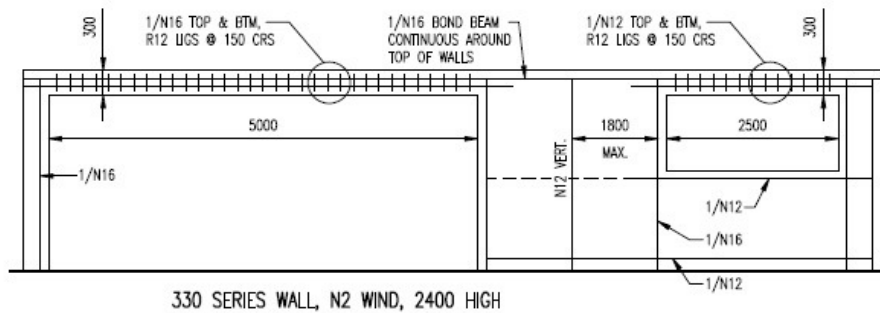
2400 High Wall, N2 Wind Rating, 330 Series ECO-Block (Max. roof load width: 5.8m)
